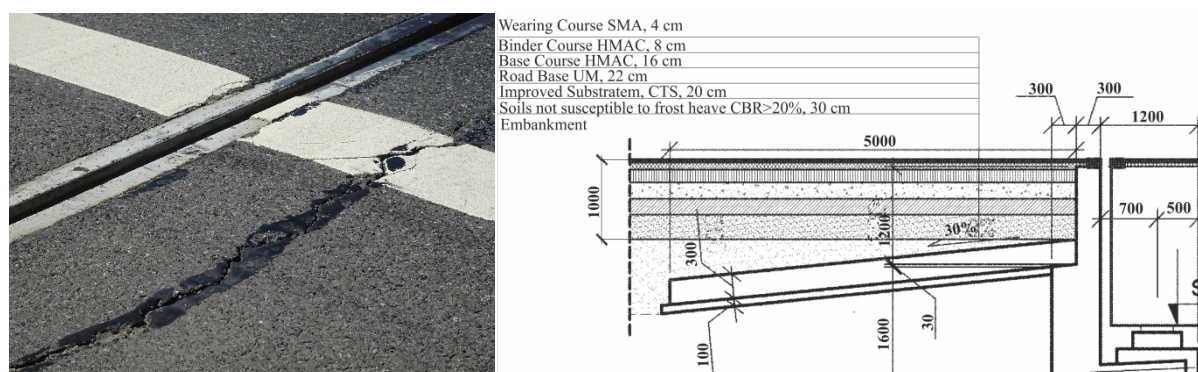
Analyzed detail, a) approach pavement surface condition b) pavement structure details.
